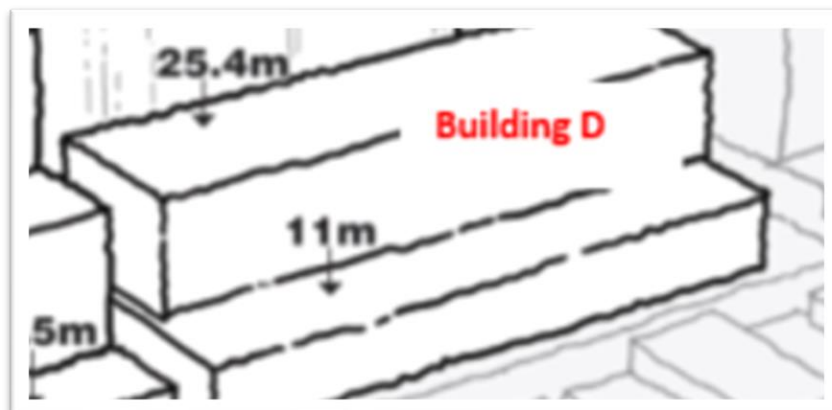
Proposed heights of Building D. Source: Development Plan (2023)
